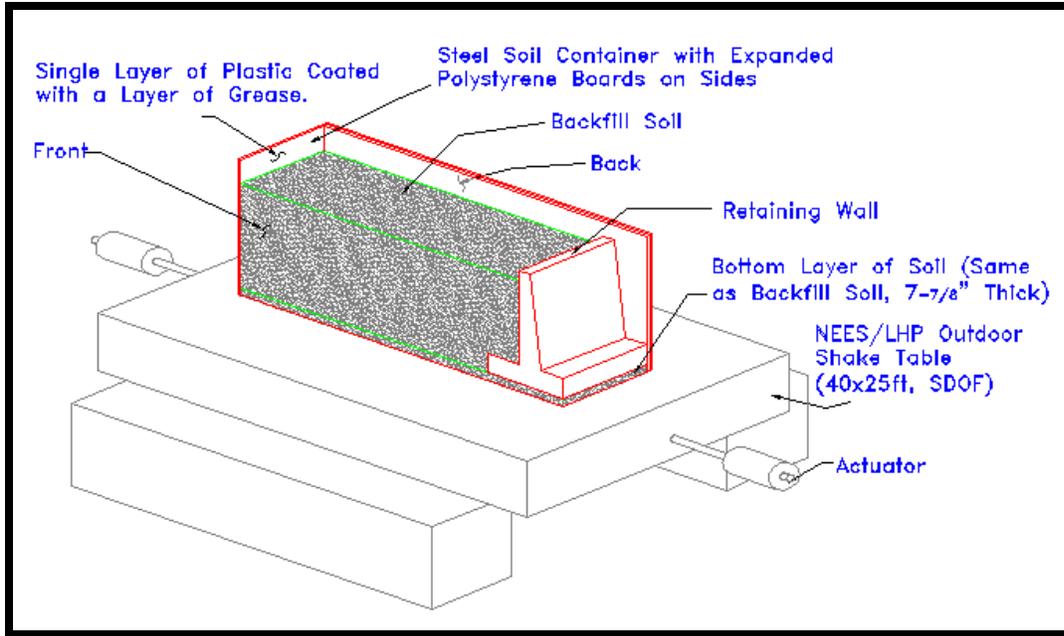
Shake table setup for the retaining wall specimen without a sound wall barrier.
